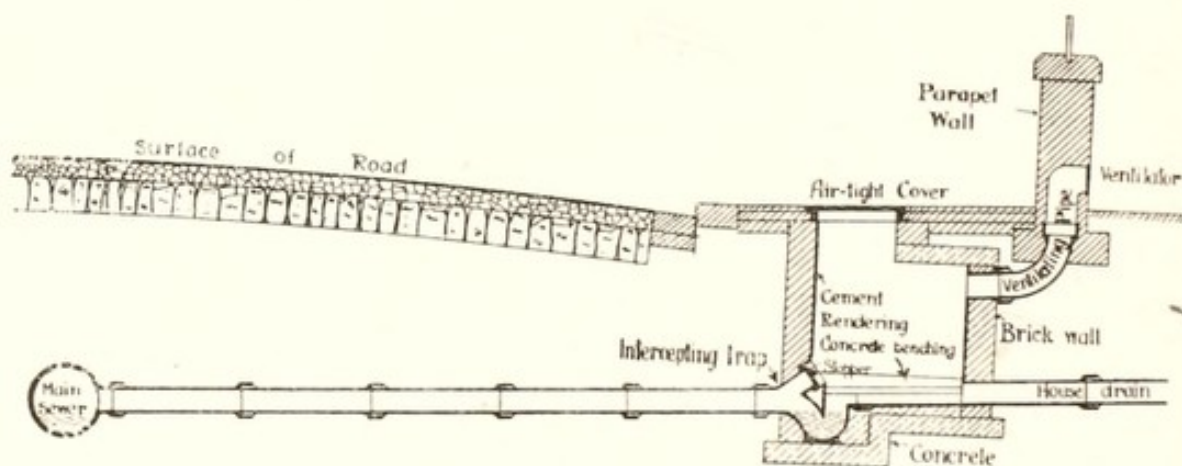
SHOWS ARRANGEMENT OF MAIN INTERCEPTING CHAMBER, ITS VENTILATION BY GRATING AT PARAPET WALL. ALSO THE POSITION OF THE SEWER IN THE STREET.
